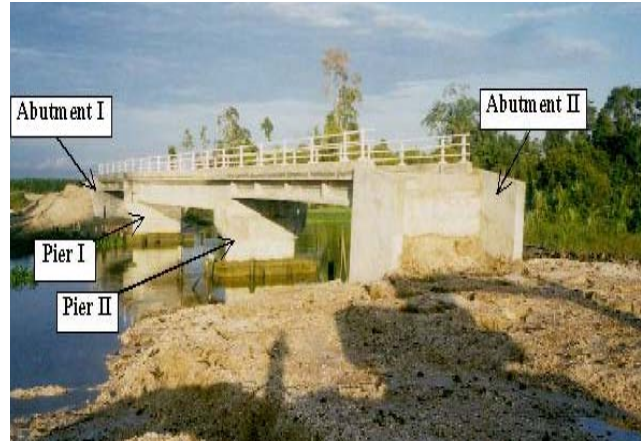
Overview failed embankment (After Gue & Tan, 2003)
